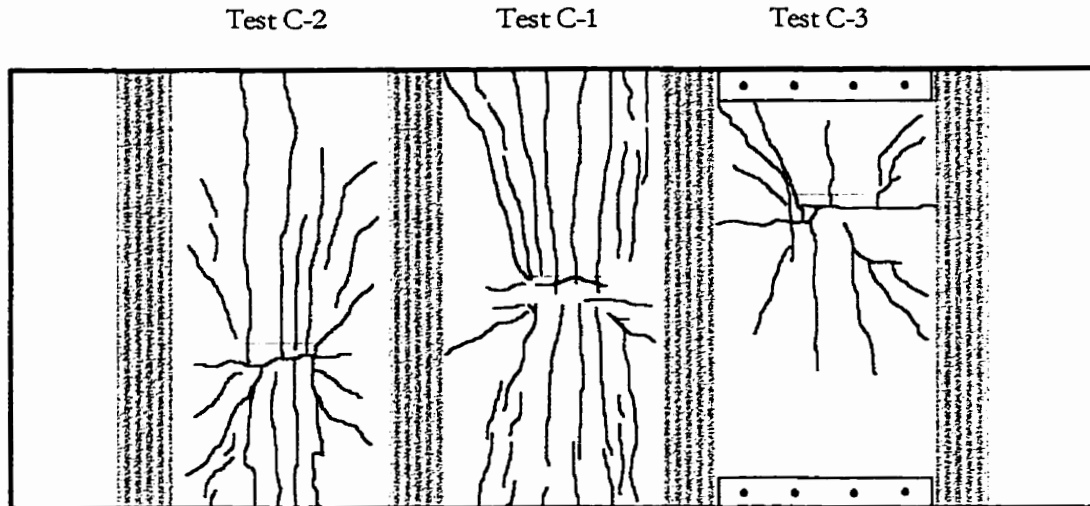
Cracks at 600 kN for CFRP-Reinforced Slab
